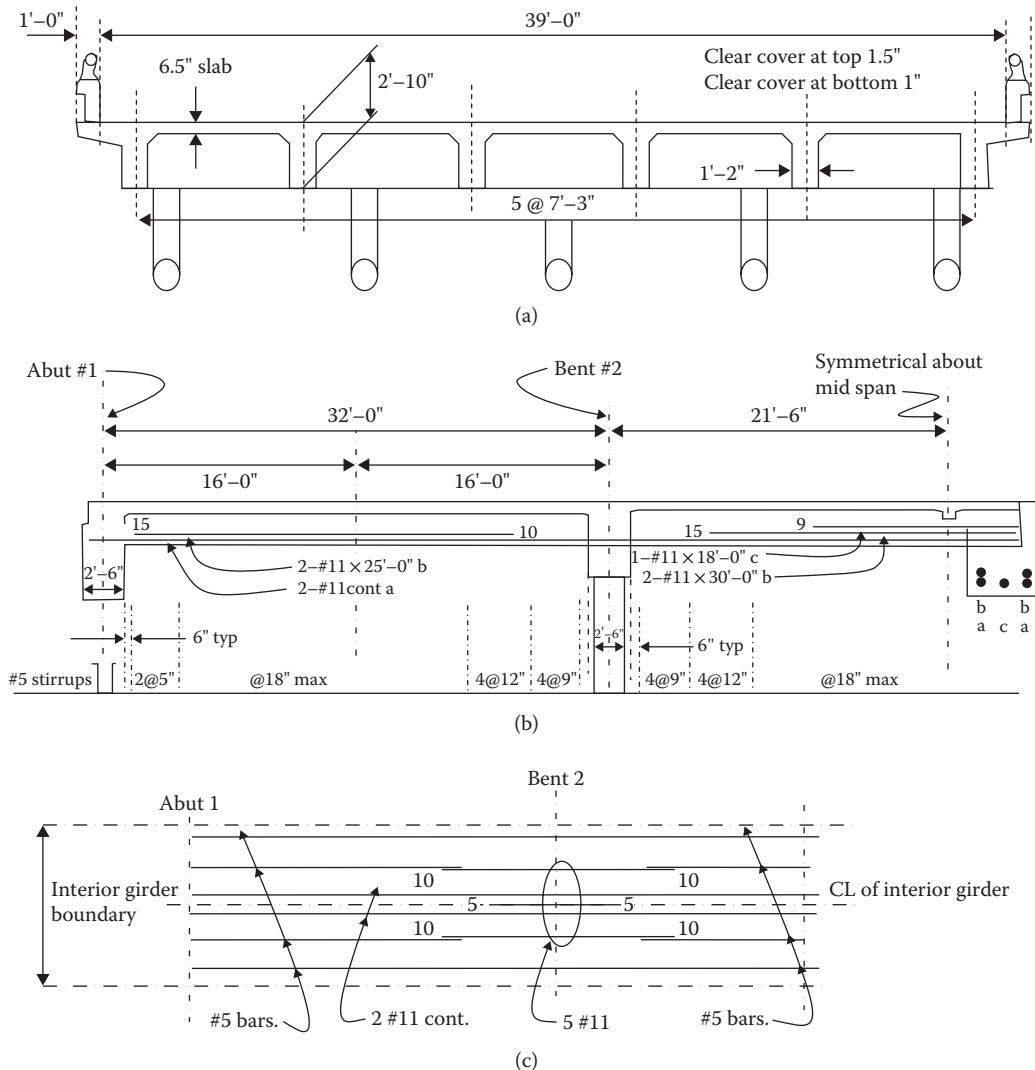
Details of three-span continuous RC T-beam bridge example: (a) Typical section, (b) bottom flexural and shear reinforcement, and (c) top flexural reinforcement detail of typical interior girder.
